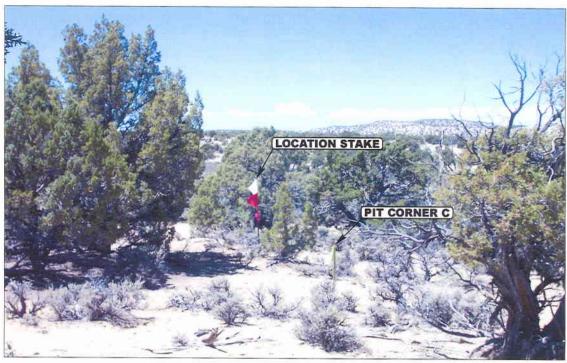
PHOTO: VIEW FROM PIT CORNER C TO LOCATION STAKE
